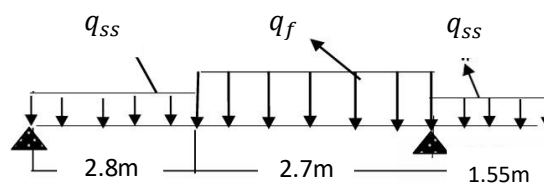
GROUND FLOOR STAIRS STATIC DIAGRAM
